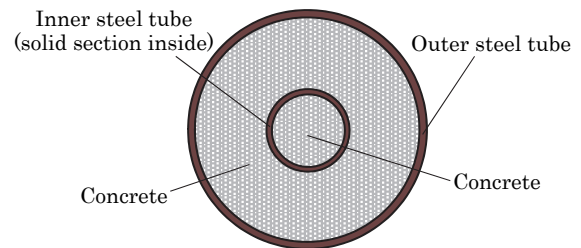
Cross-Section of column with concrete-filled double-layer steel tubes
